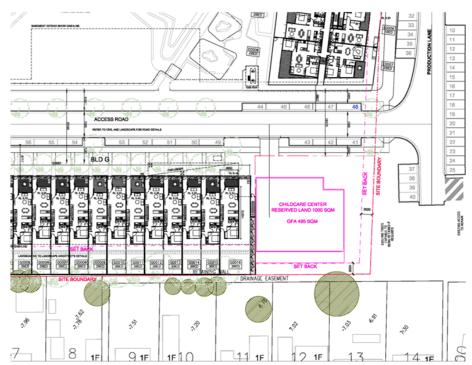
Stage 1 Ground Floor Plan Extract (Source: PTW)
